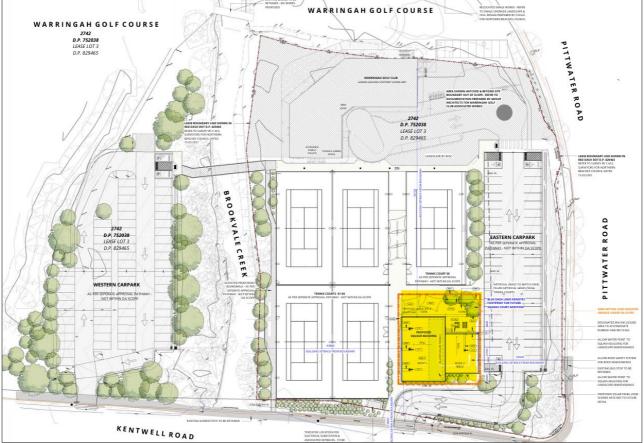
Site plan with proposed development highlighted (source: Webber Architects)
